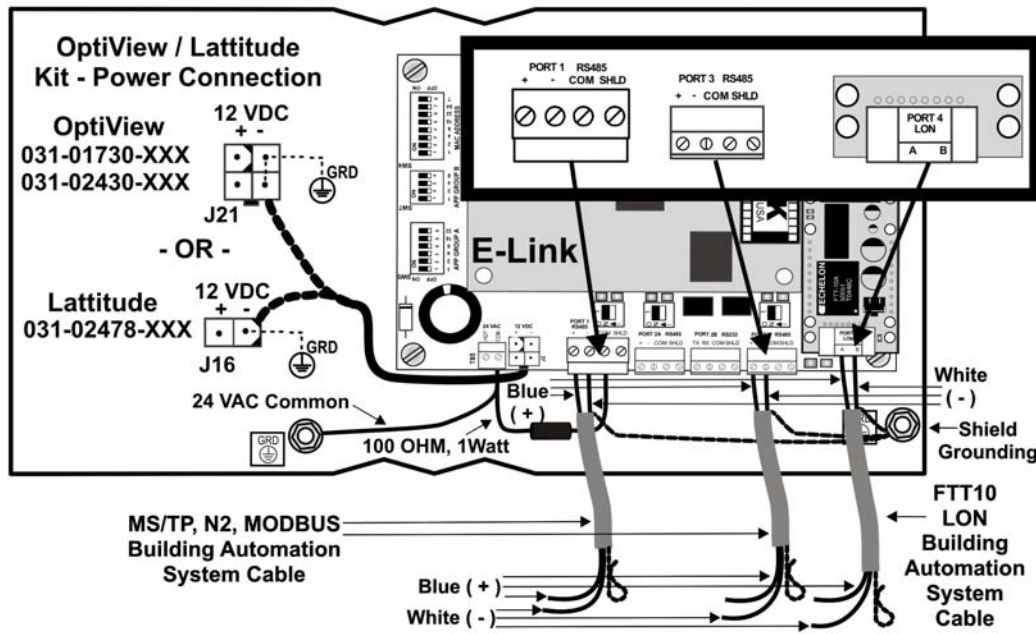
E-Link Gateway to YPAL (ECO2) and YCAL Equipment Connections
